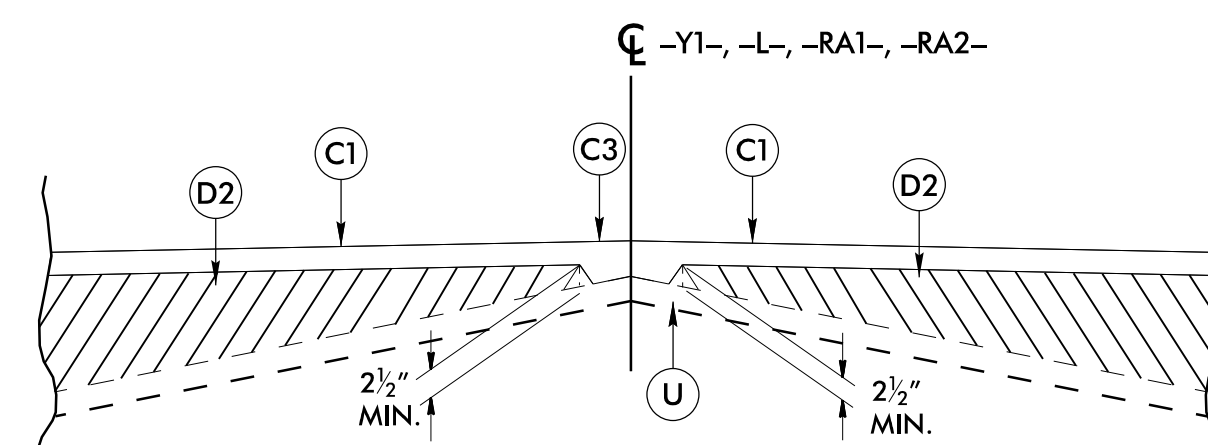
"-1.25" Milling At Pavement Tie-In
